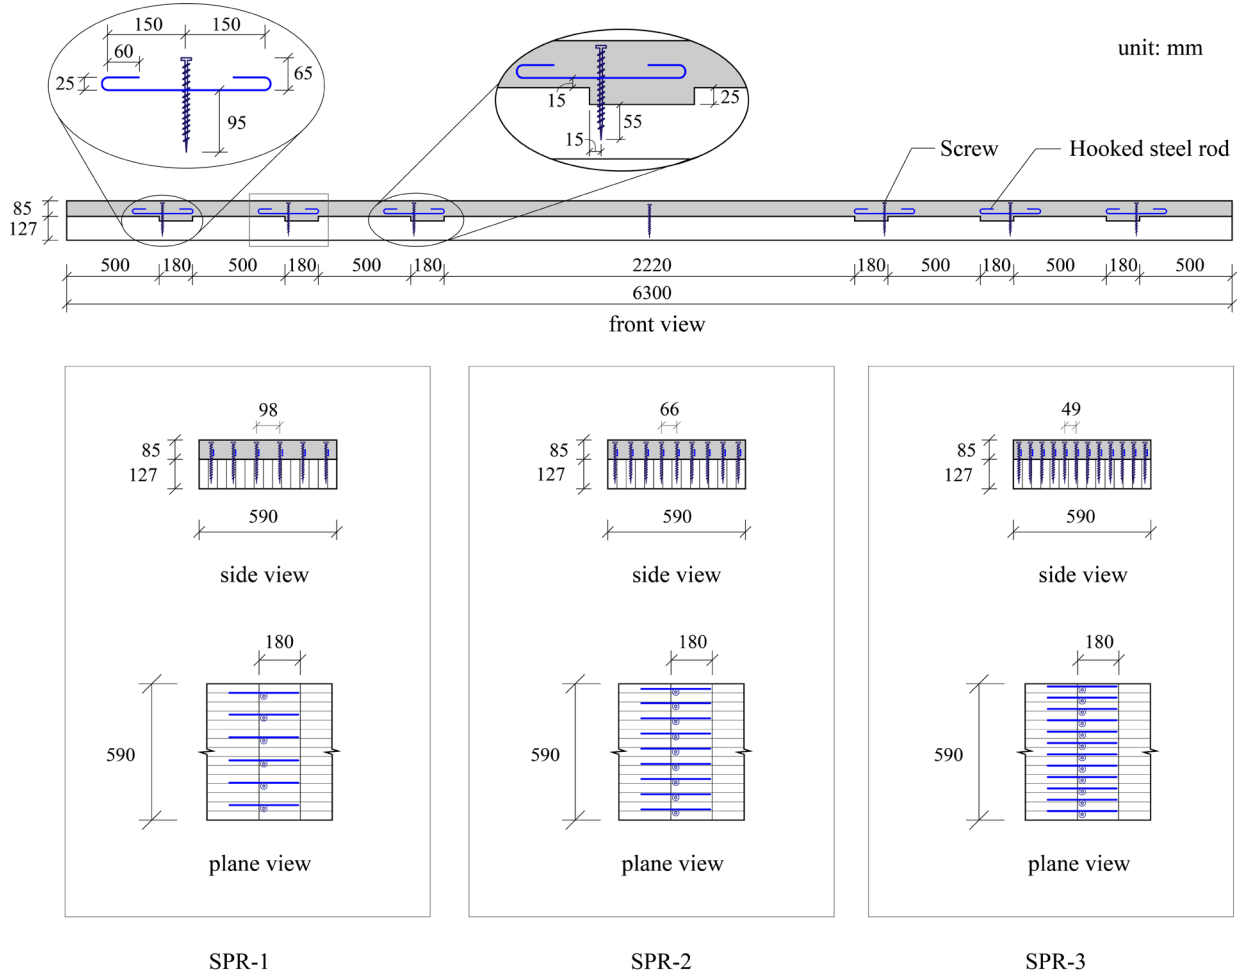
Mass timber panel-concrete composite floors with reinforced notched connections
